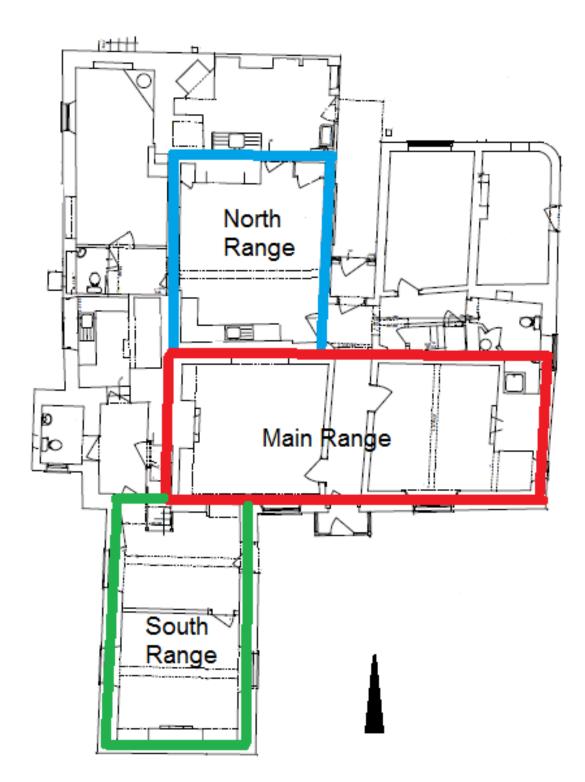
Ground-floor plan, showing the layout of the building (Quentin Alder Architects)
